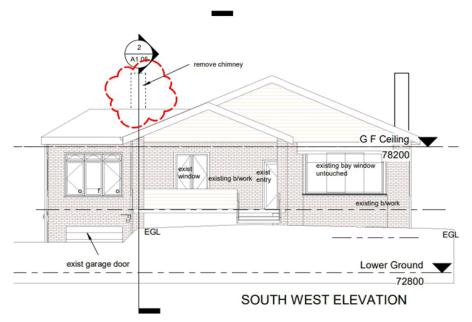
The chimney that has been removed is shown dashed on this front elevation plan.
